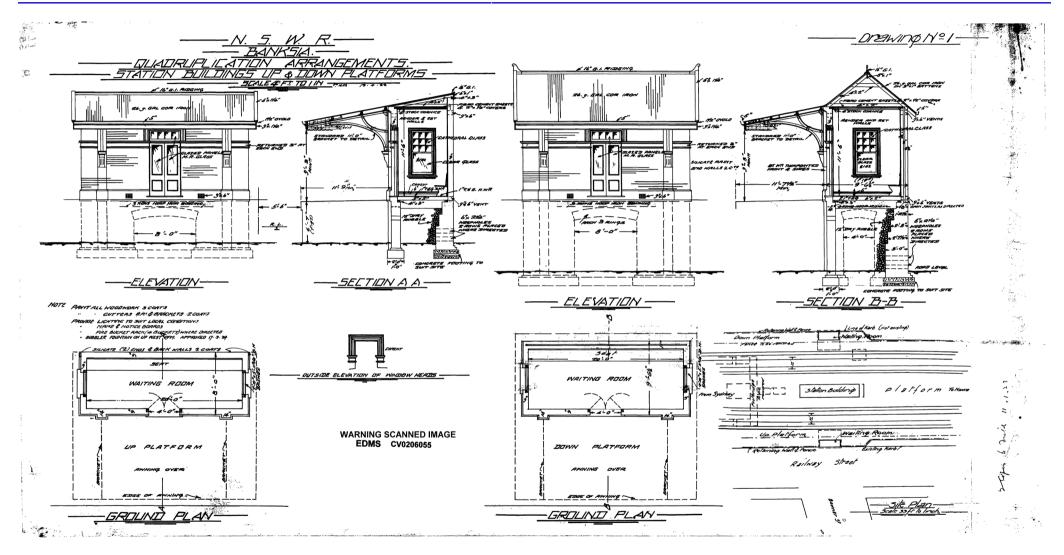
N.S.W.R Banksia Station quadruplication arrangements – station buildings up and down platforms, c. 1922 (Source: Sydney Trains plan room)
